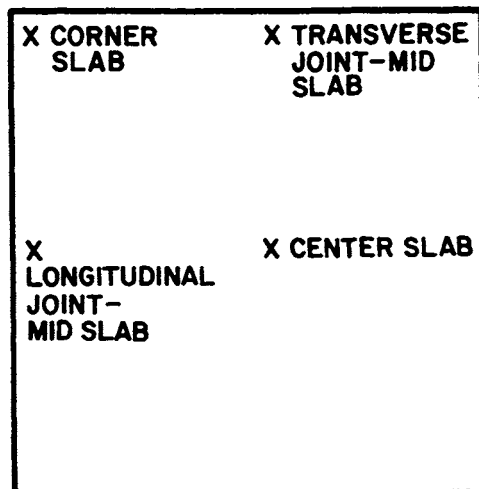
Recommended NDT Test Pattern for PCC Slab.
